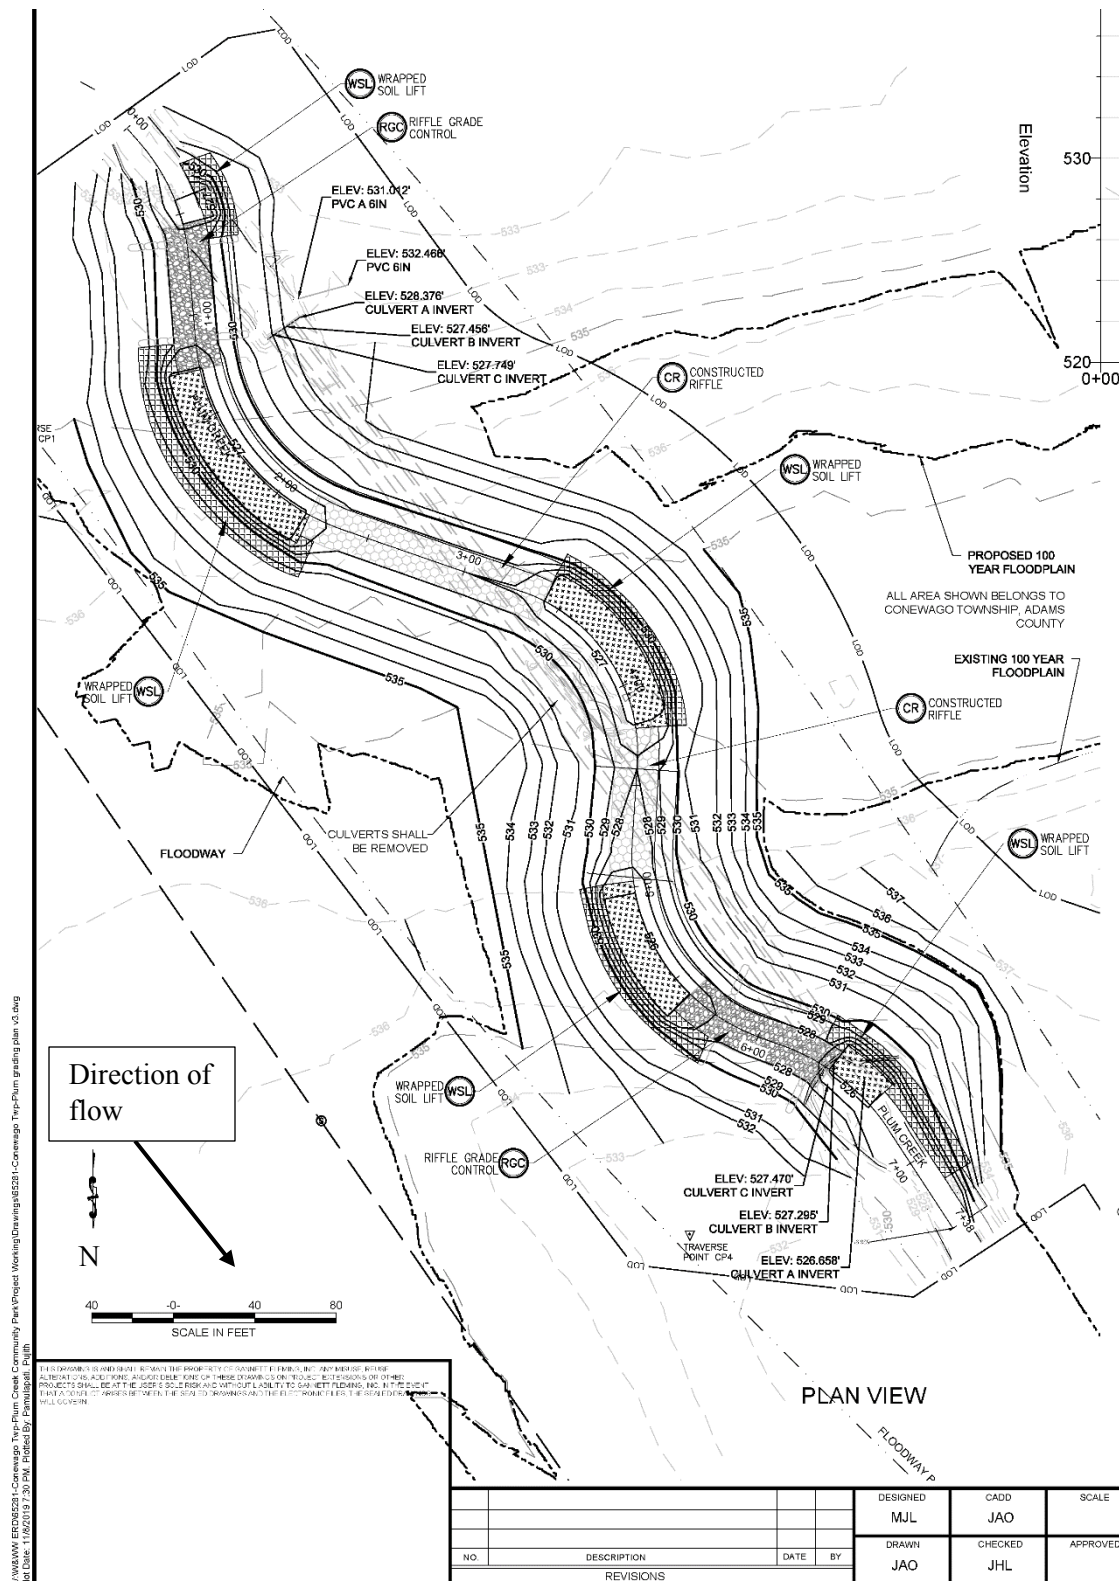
Plan view of a proposed stream restoration, showing constructed stream sinuosity.
